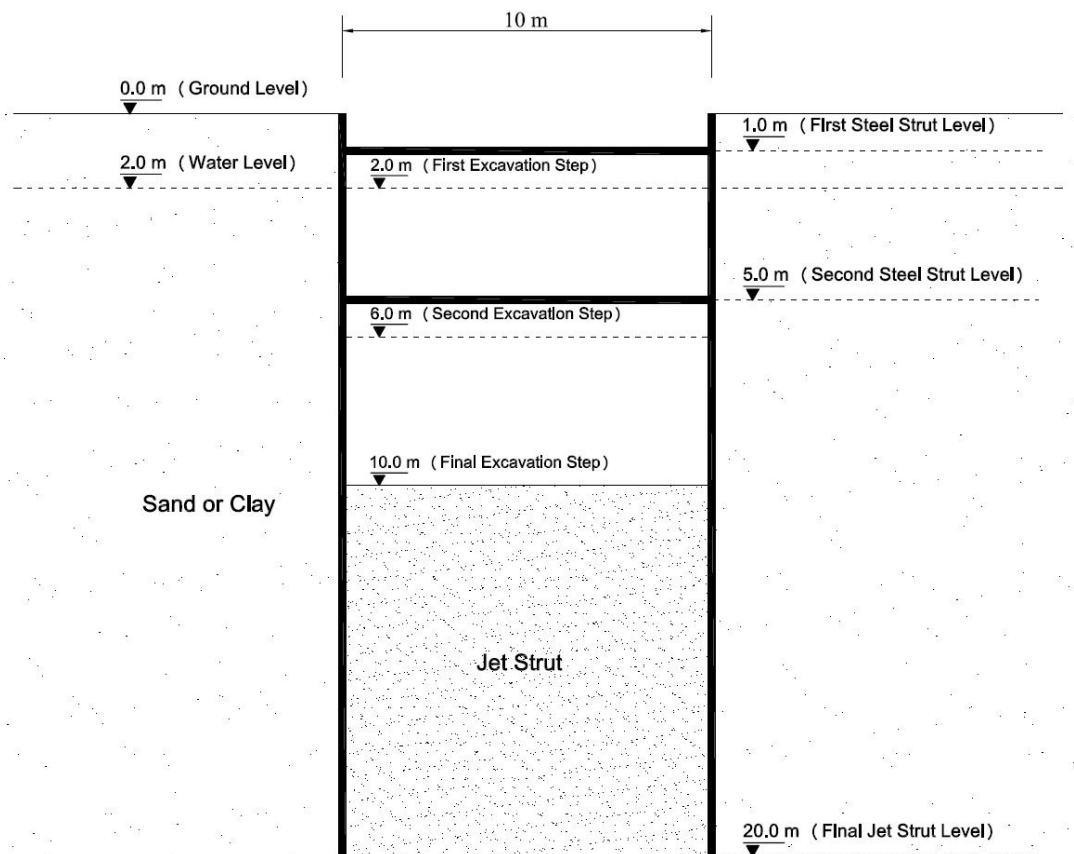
Jet Grouting Strut Location I: Jet struts between 10 m and 20 m
